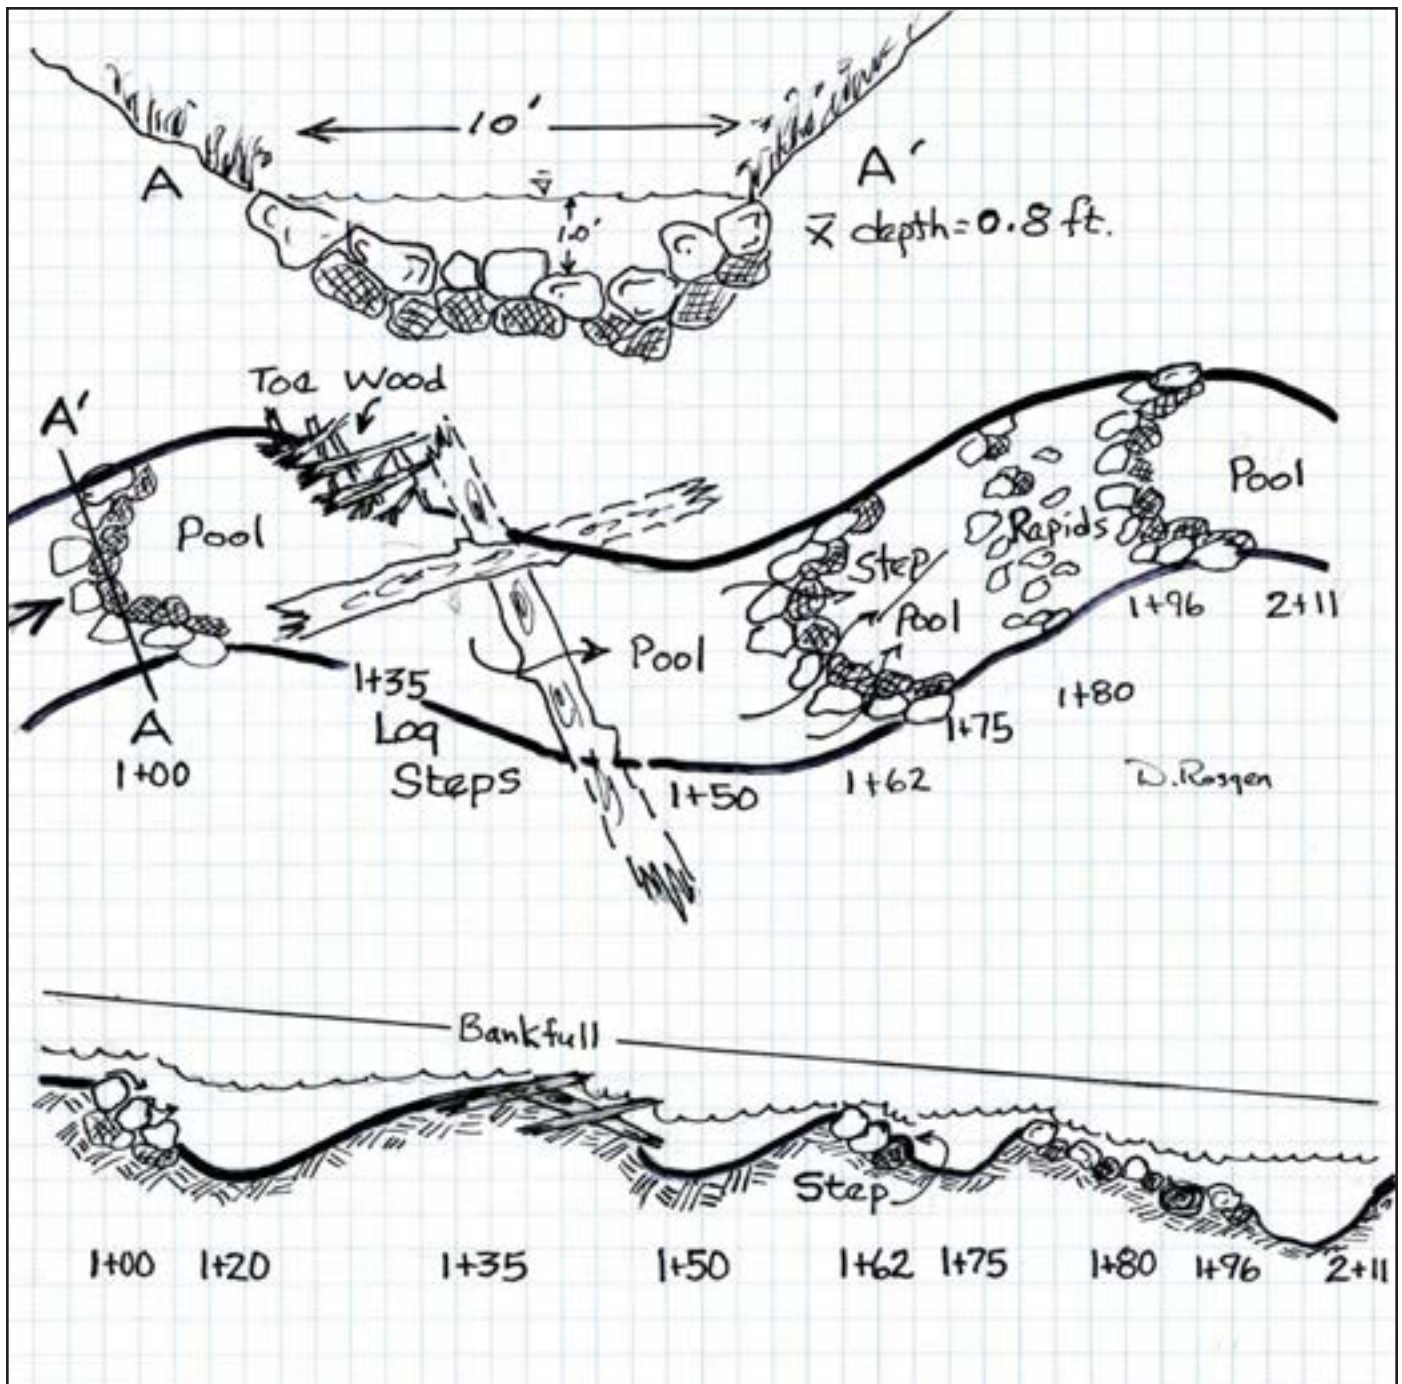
Typical cross-section, plan and profile views of the proposed B2 stream type and associated structures.
